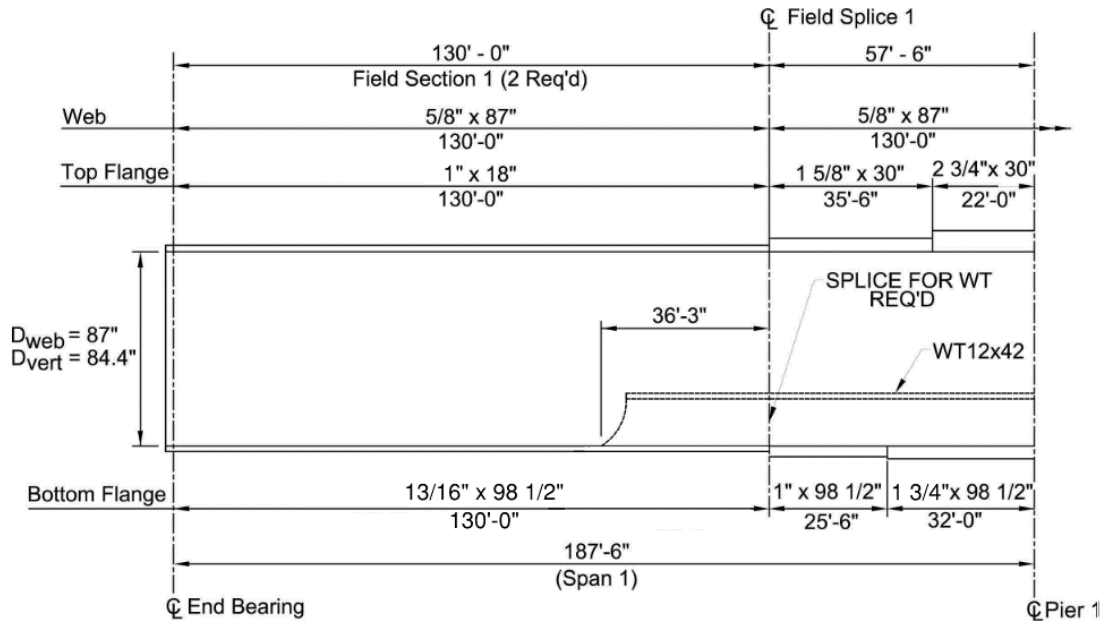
Option B in Elevation, Stiffened Bottom Flange
